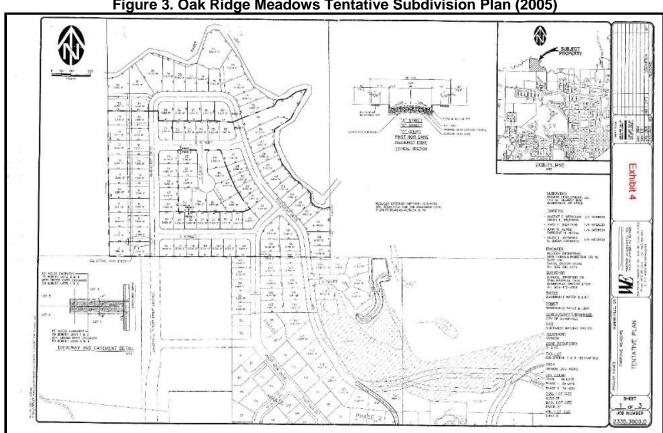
Oak Ridge Meadows Tentative Subdivision Plan (2005)
